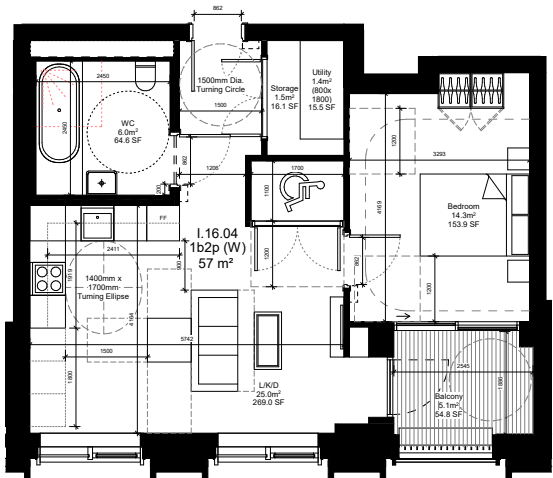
Typical Wheelchair Accessible Apartment Plans
